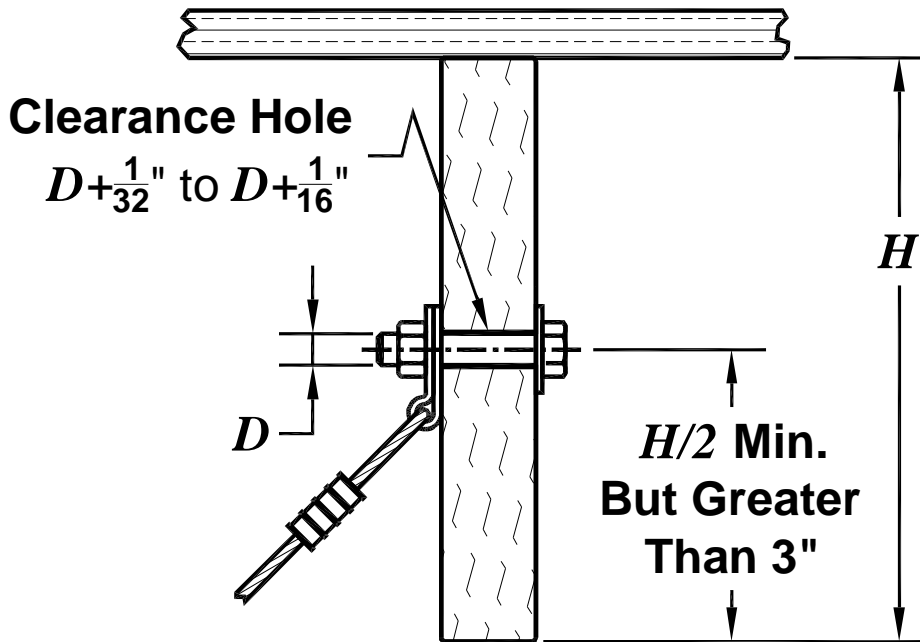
; KSUA Attached to a Wooden Joist or Beam in Orientation 2 Using a Through Bolt
